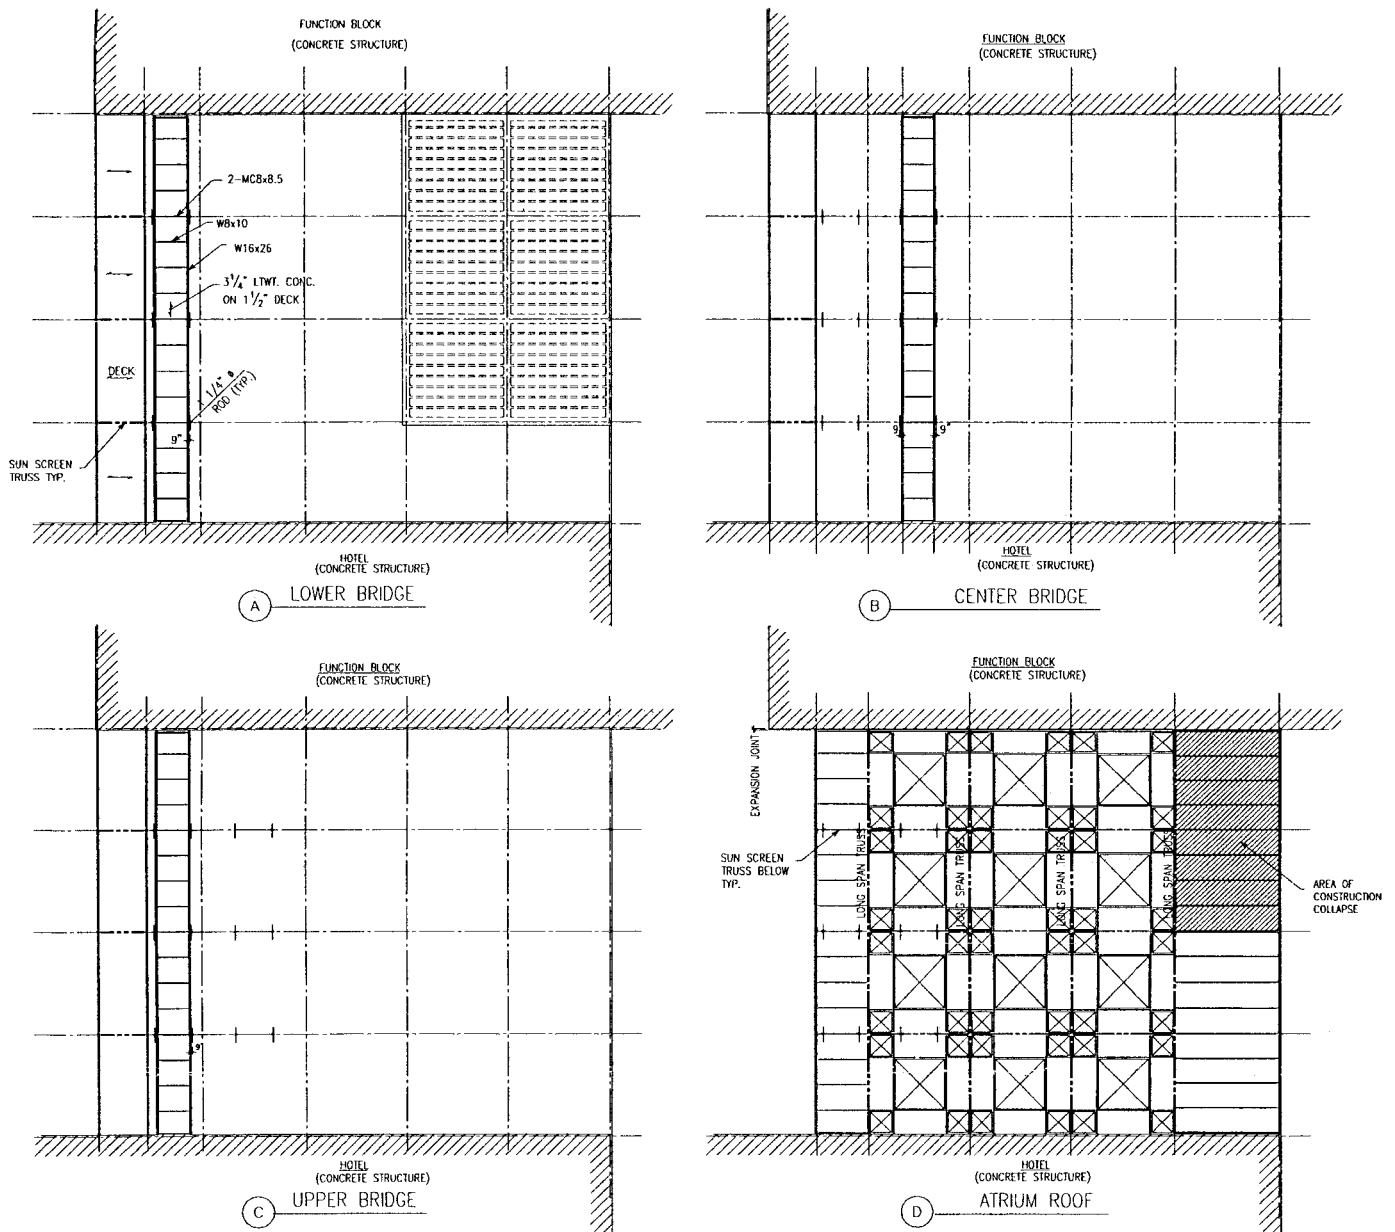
Floor Plans of Roof and Walkways at Kansas City Hyatt
